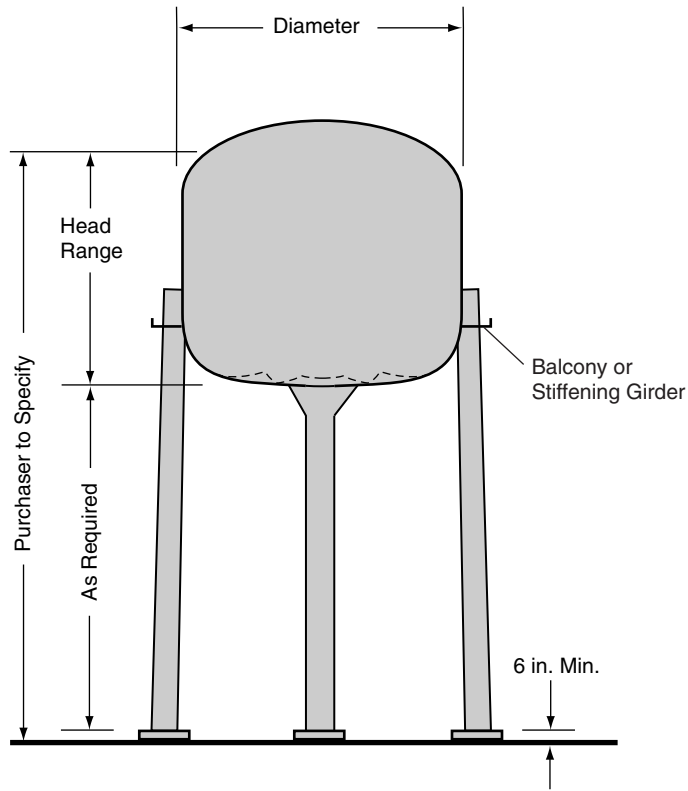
Cross-sectional view of medium-capacity, torus-bottom welded elevated tank
